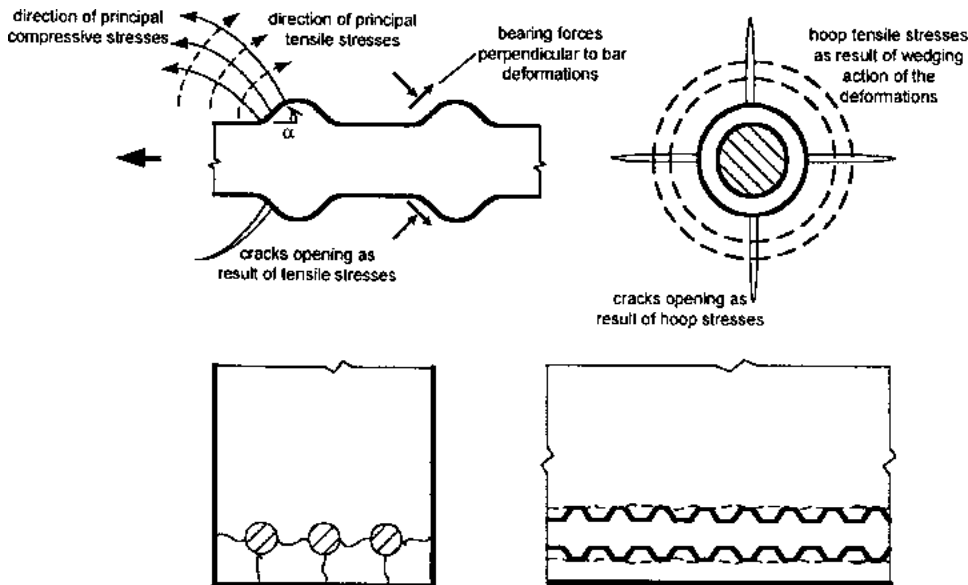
Cracking mechanisms for bond failure of reinforcement embedded in concrete (Joint ACI-ASCE Committee 408 2003).
